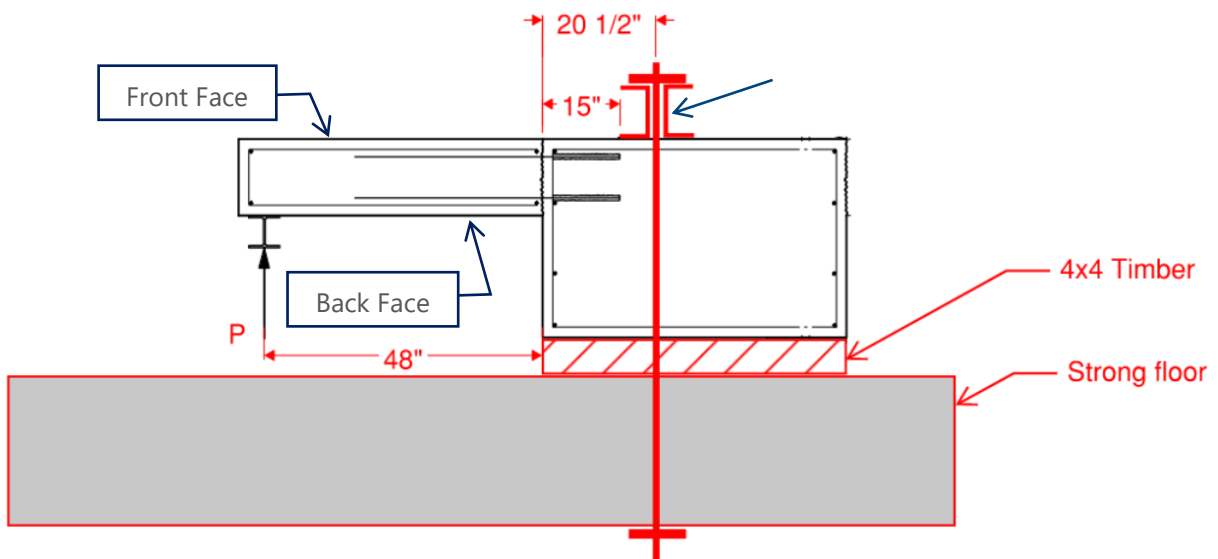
Schematic of test setup. Note: the 15-inch dimension indicates distance from the tip of the restraining beam's leg to the joint between upper and lower wingwalls
